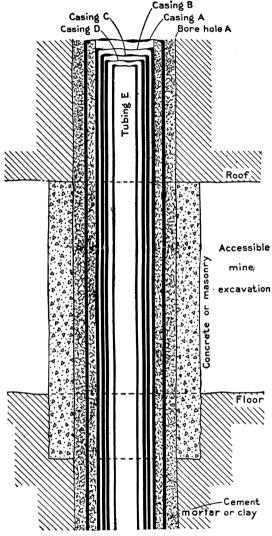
Method of protecting exposed casing with concrete or masonry.
